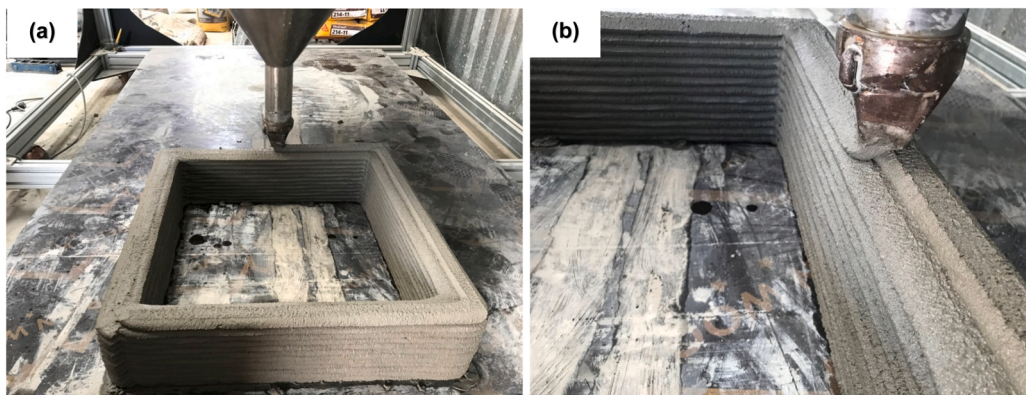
Printed structure (a) and finishing surface of printed structure using mixture G8.
